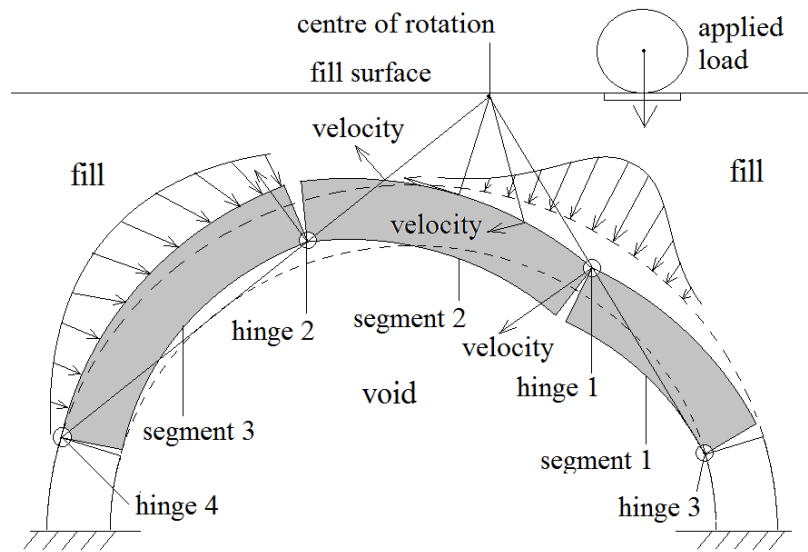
Typical four-hinged rotational failure of a masonry-arch bridge
